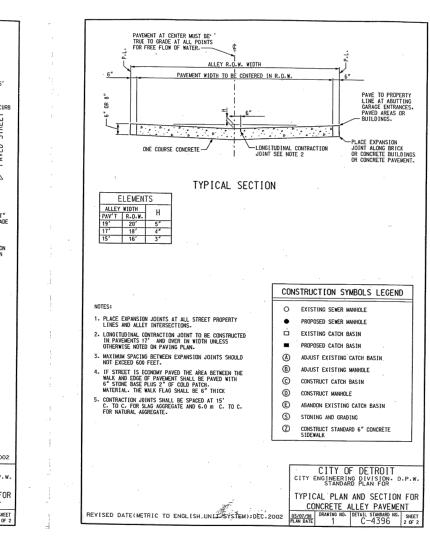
DETAIL AND STANDARD JOINTS - CITY OF DETROIT
